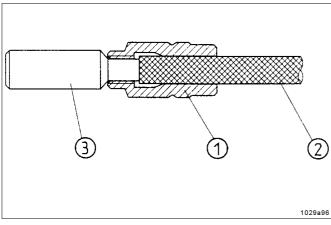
Preassembly of the threaded sleeves by means of an adjusting gauge
